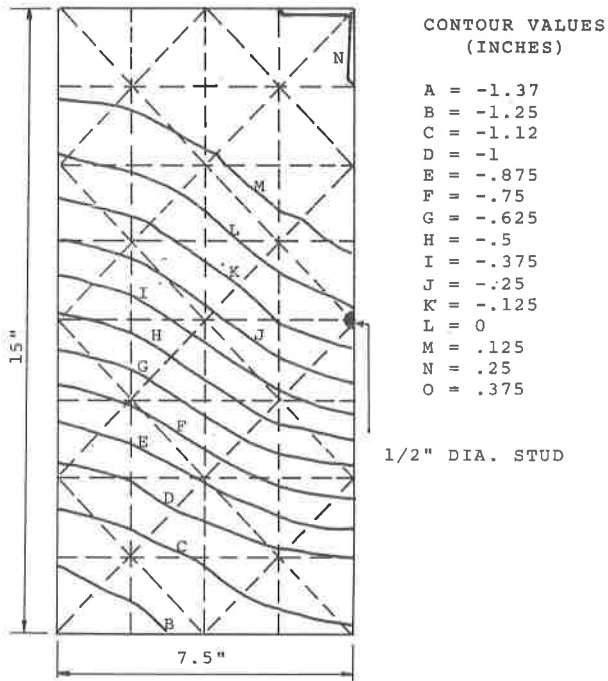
WALL LINER - ASYMMETRIC BUCKLING
